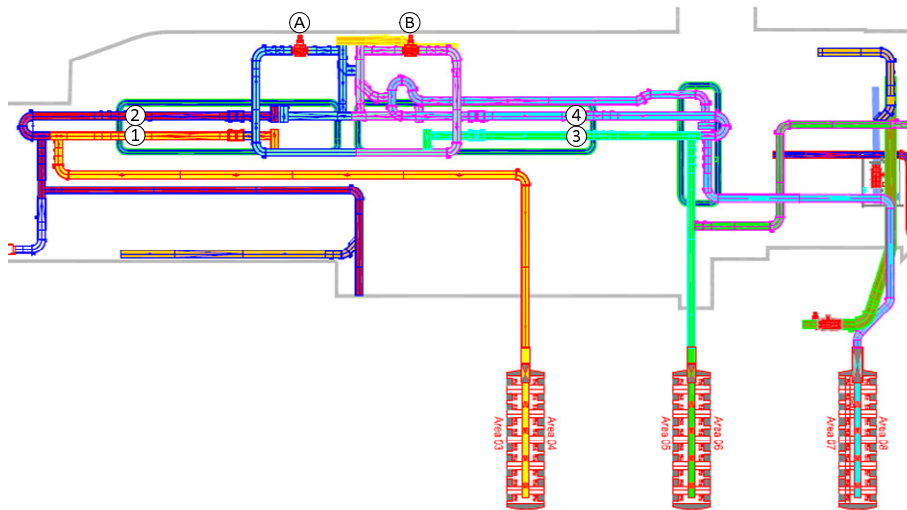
Illustration of southern section of the Terminal 1 baggage handling installation
